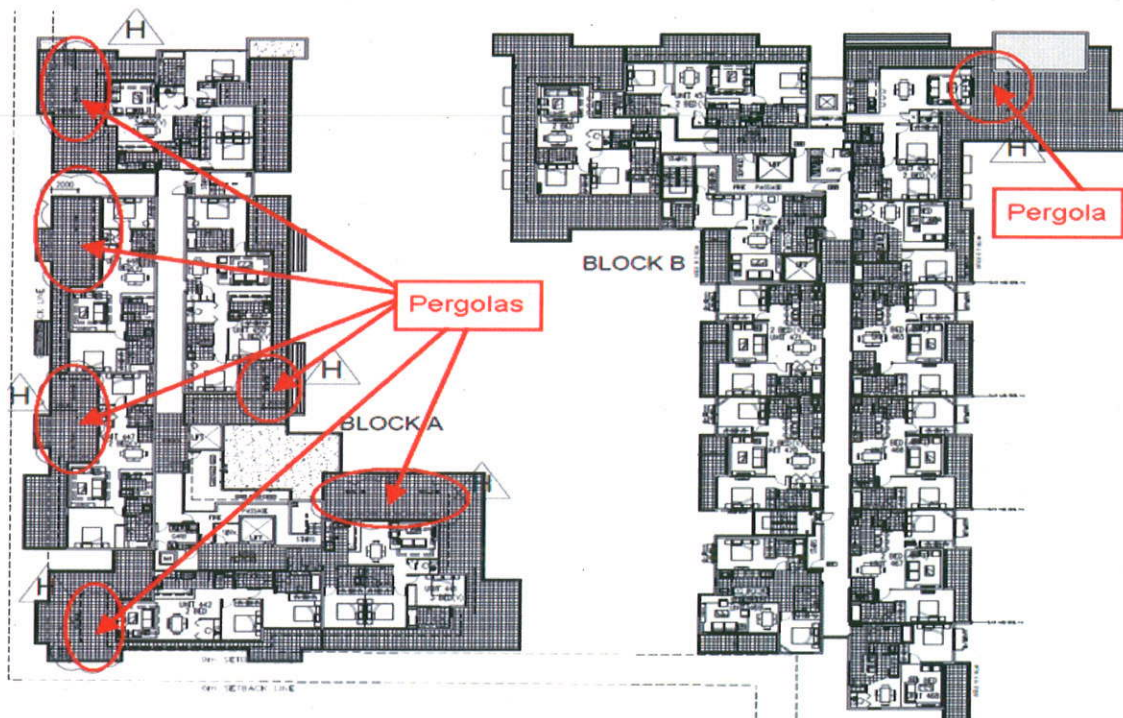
Proposed pergolas for Level 4, Blocks A & B (Stage 2 – Level 4 Plan)
